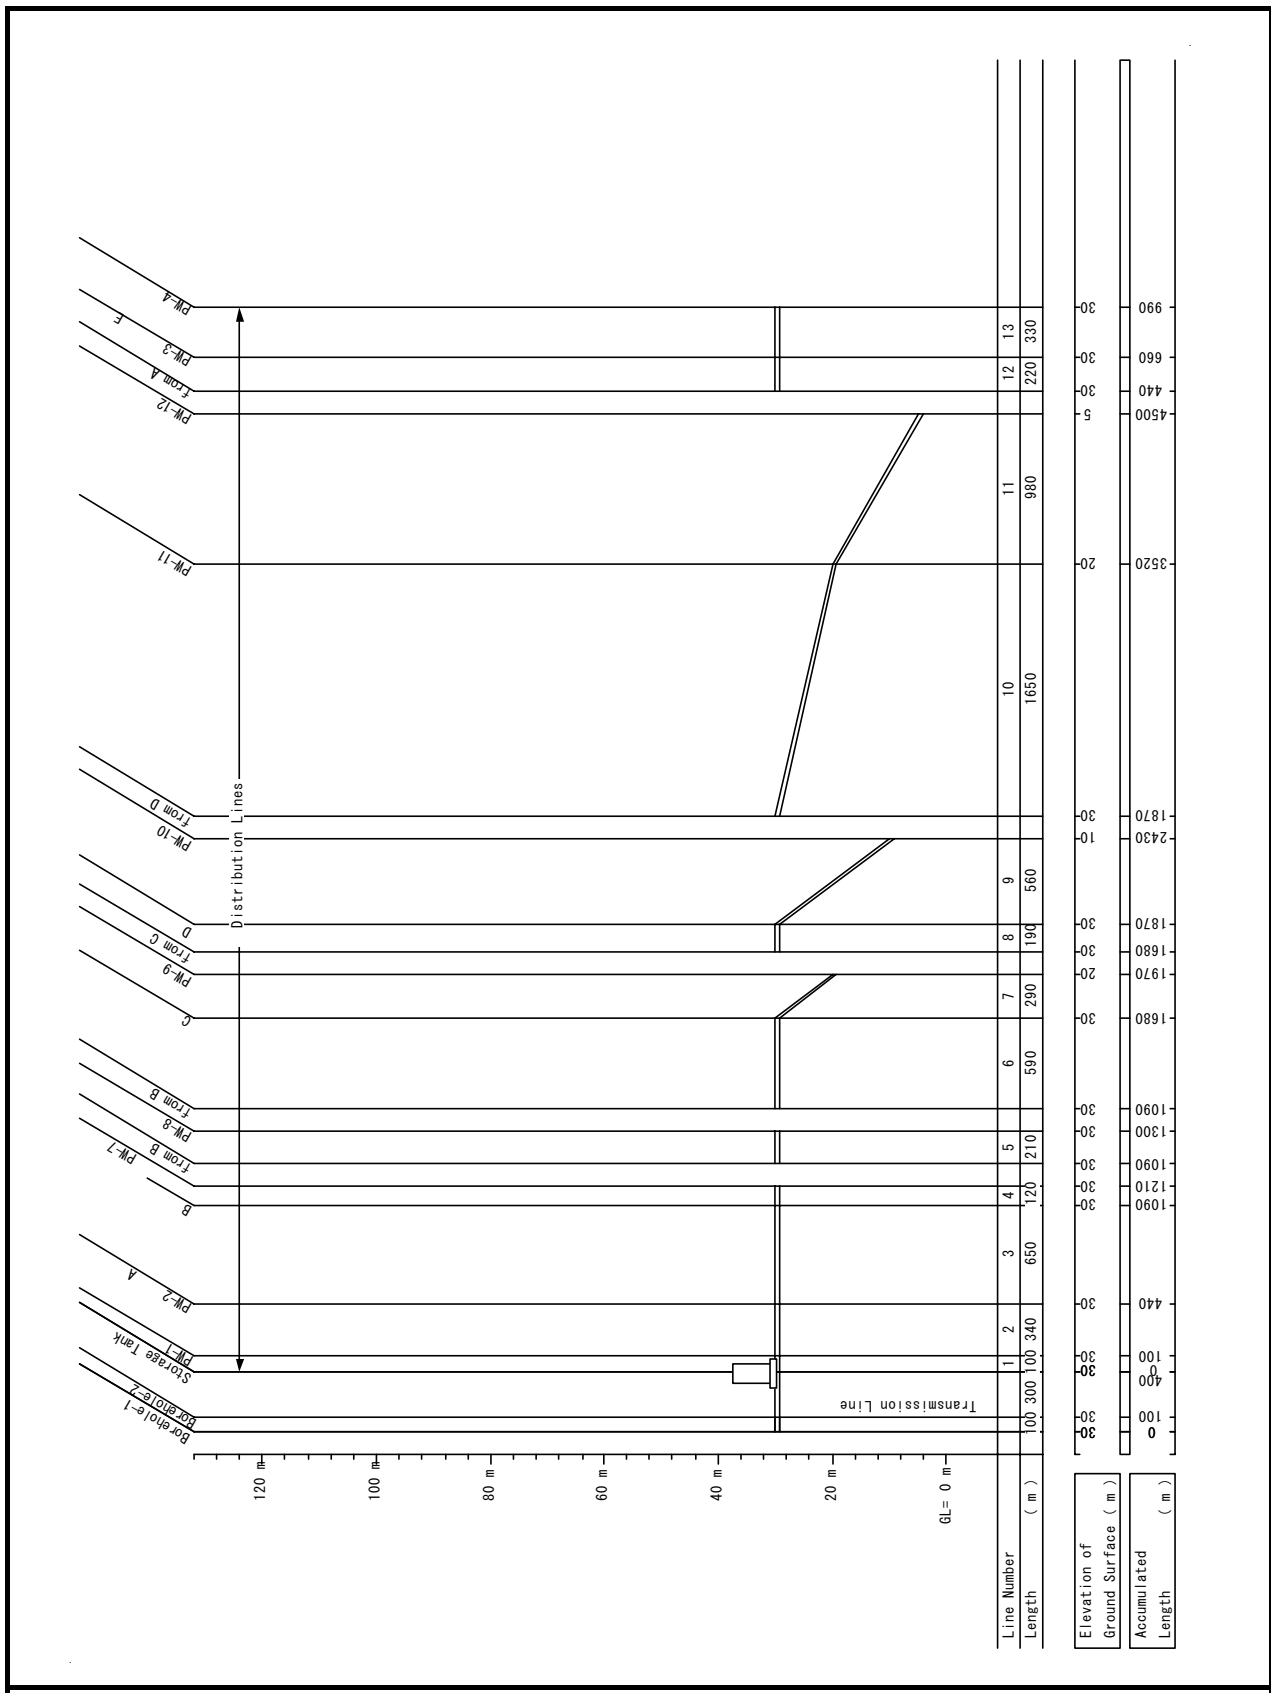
LONGITUDINAL SECTION (KITUNDA-KIVULE-1: 13/22)
